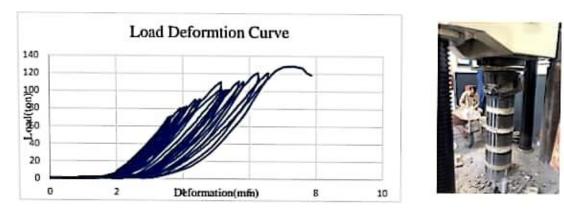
(c) Load and Deformation of CRC(FRP) Column Column
